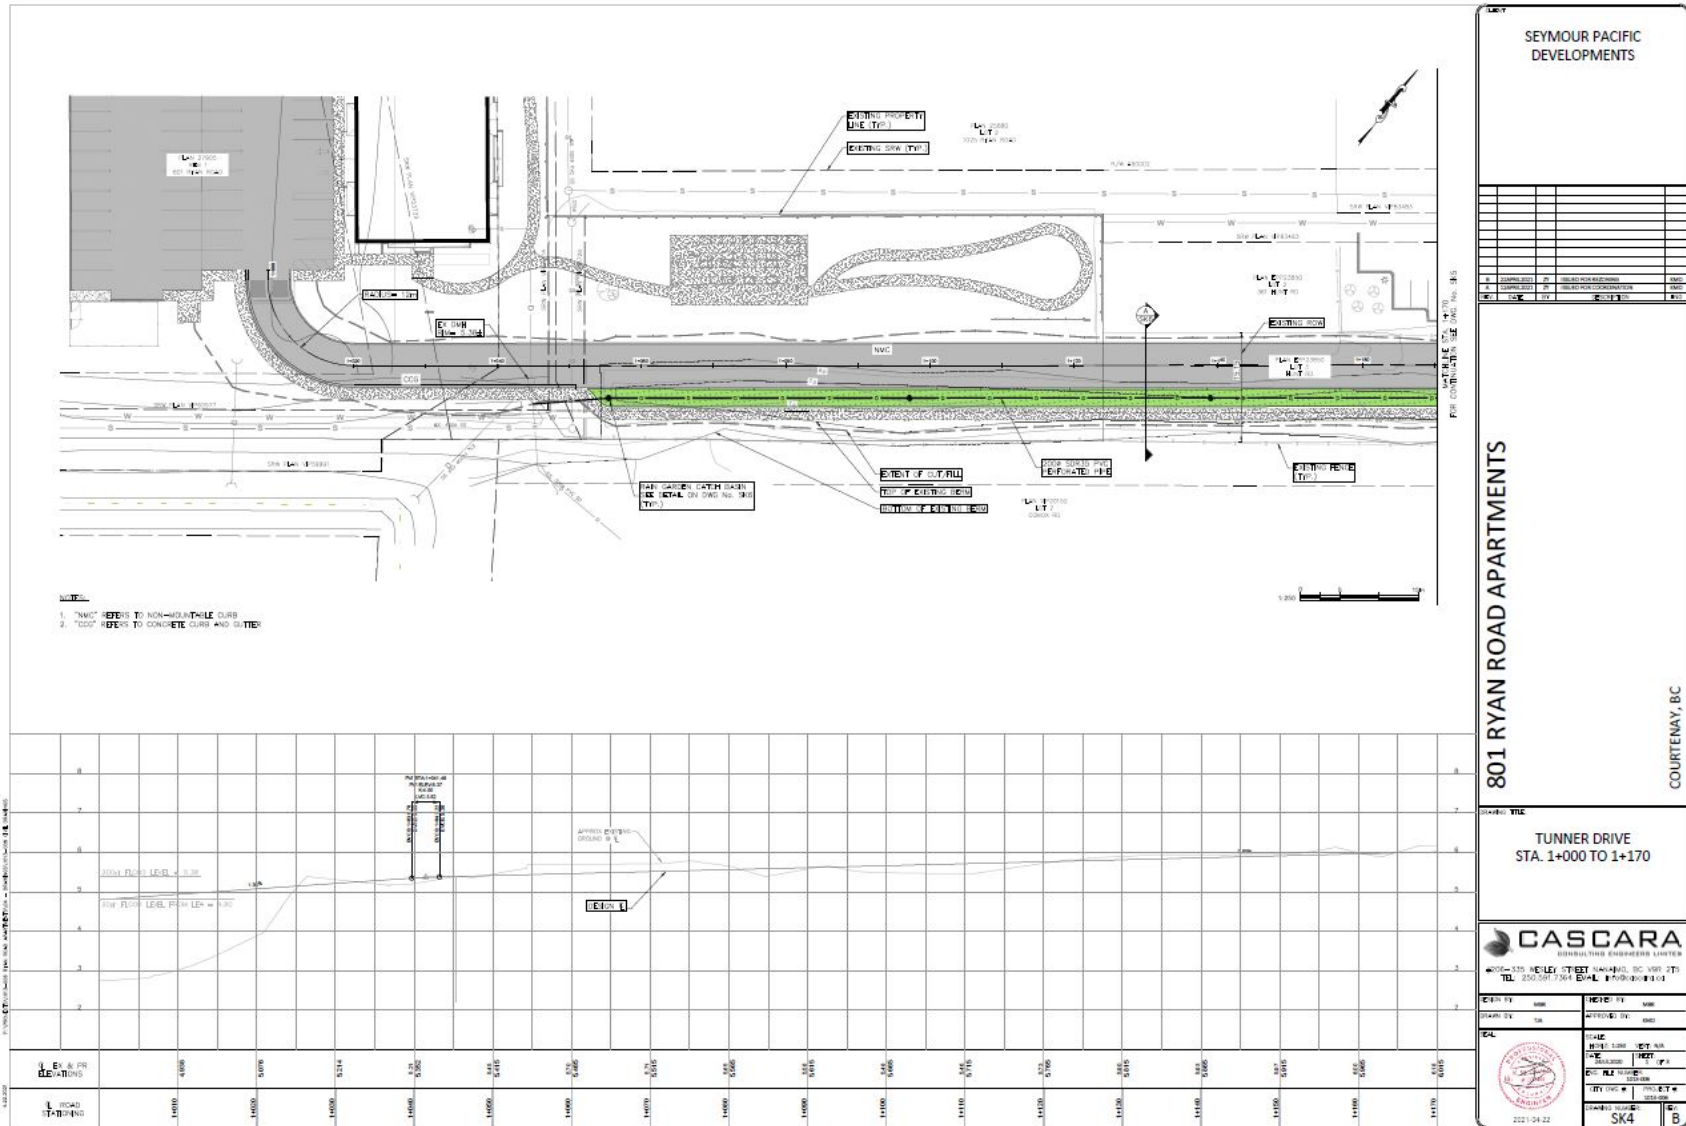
Site plan showing proposed Tunner Drive layout (Sta. 1+000 to 1+170).
